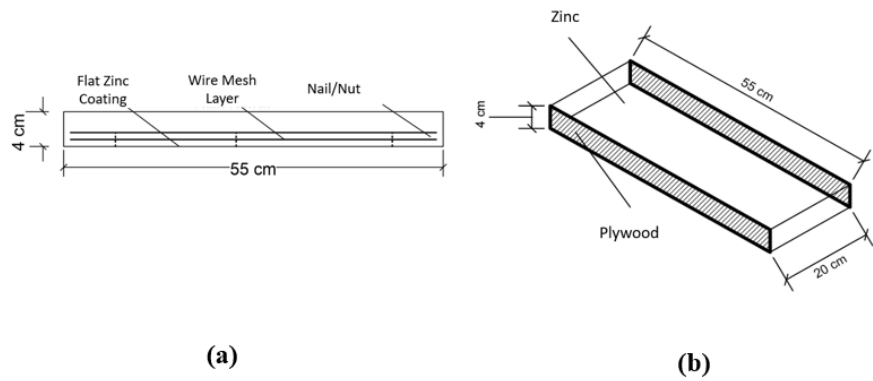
Dimensions of zinc-coated ferrocement test specimen molds: (a) side view and (b) 3D view.
